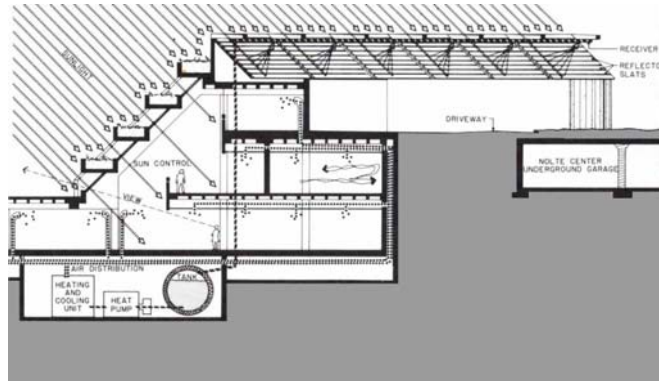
Detailed section showing the 45-degree sloped glazing.
